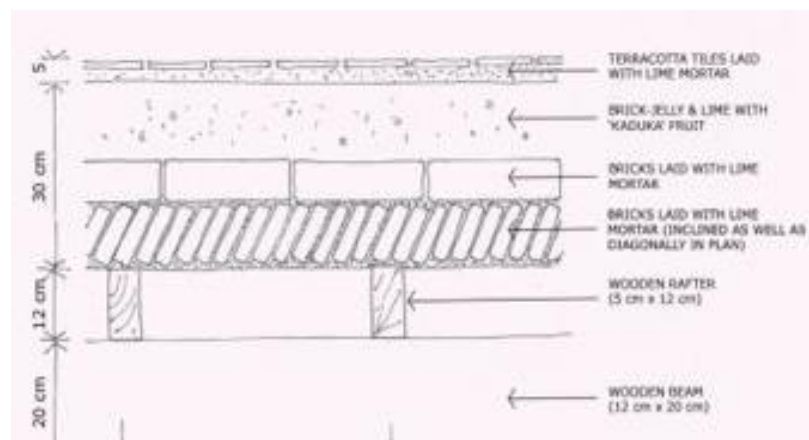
Section of a typical Madras terrace roof (Auroville.org, 2009).
